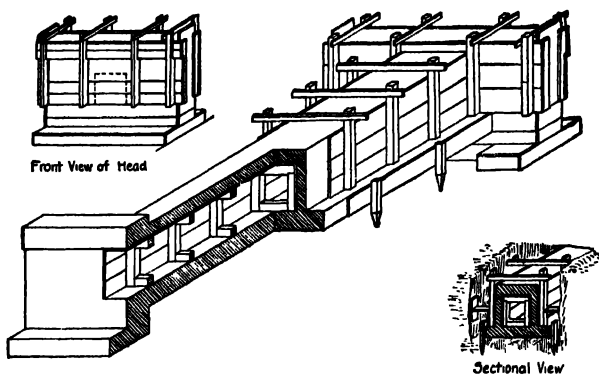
Forms for small box culvert—Mass. Highway Commission.
